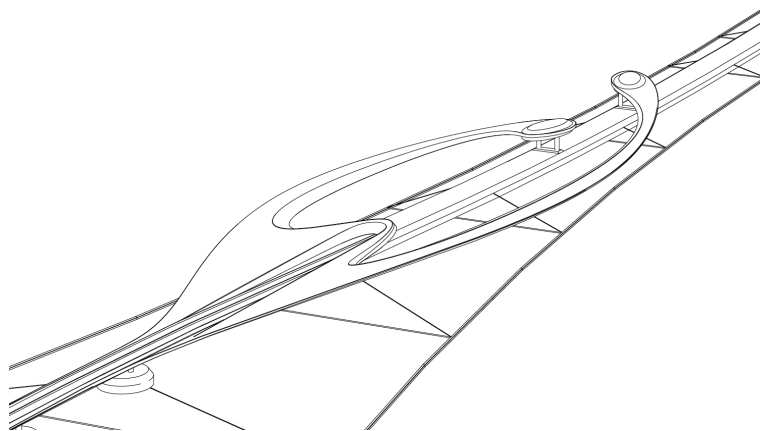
Overview of collision barriers on bridge 3; provided by Reinertsen AS
